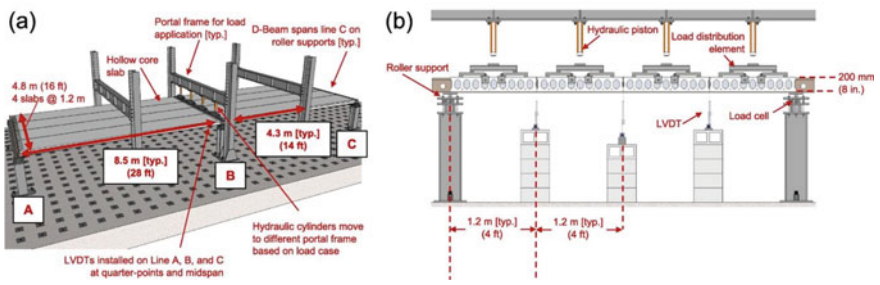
a Overview of the full-scale composite experimental setup, b Elevation of the composite component specimen [14]
